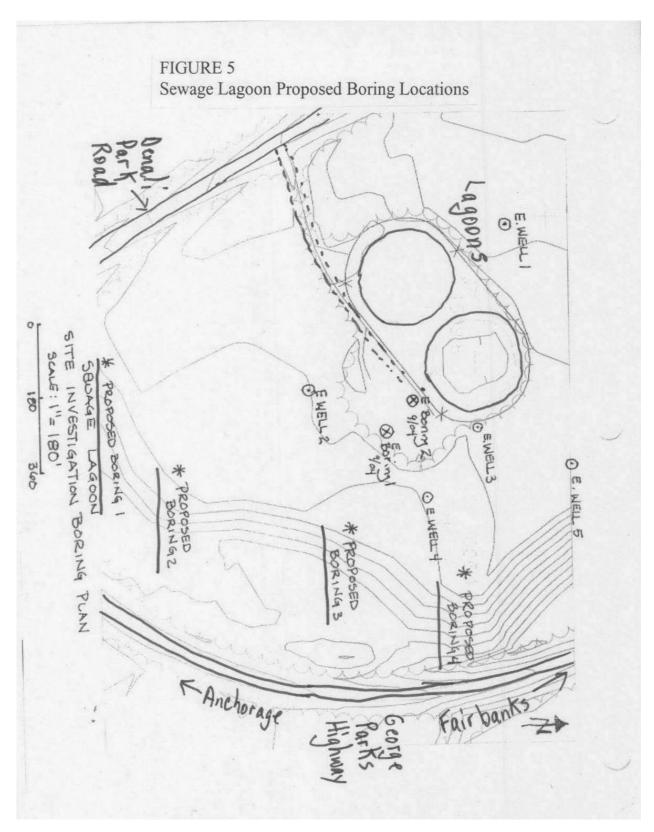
SEWAGE LAGOON PROPOSED BORING LOCATIONS
